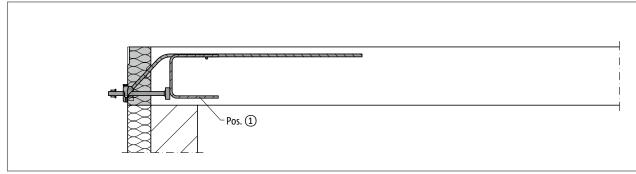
Schöck Isokorb® T type SQ: On-site reinforcement: Cross section
